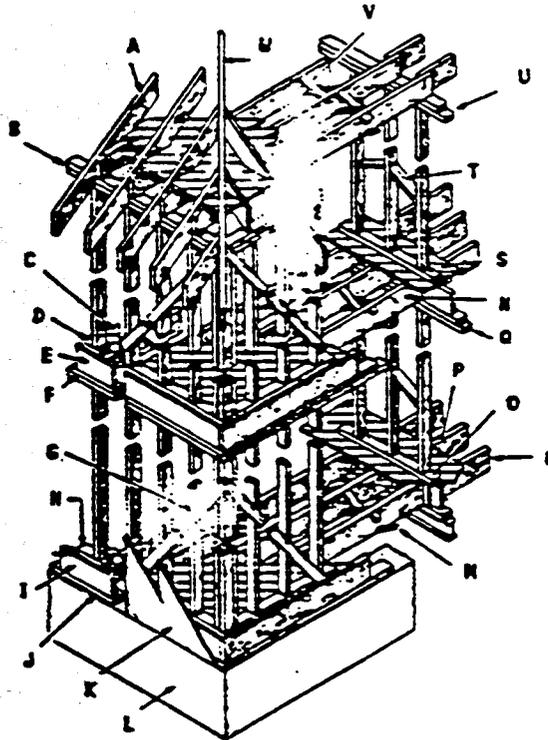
Method of supporting upper floor joist ends in balloon framing.
